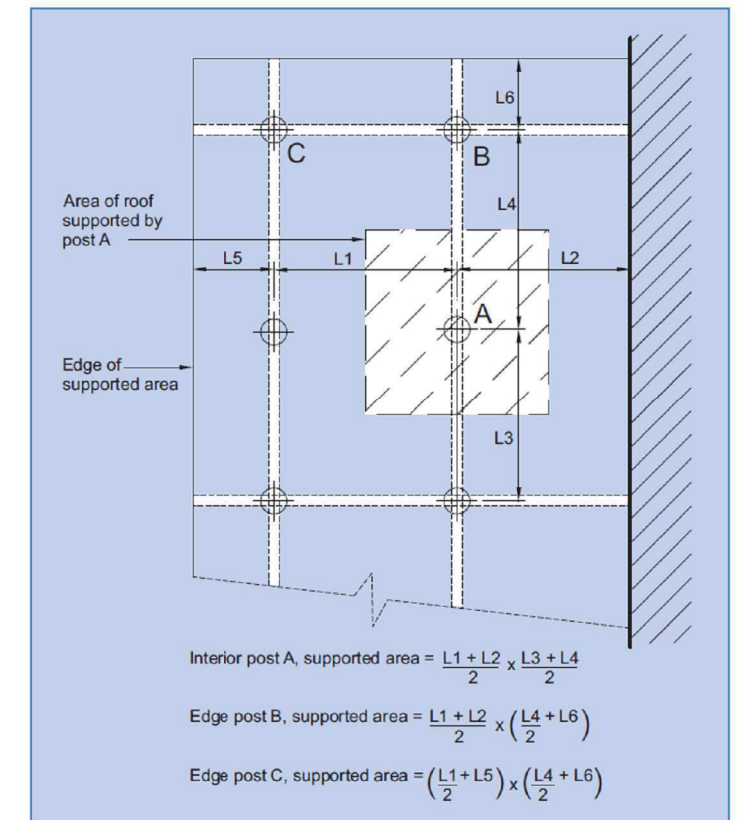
Area of roof supported by post (see 9.2.2)
